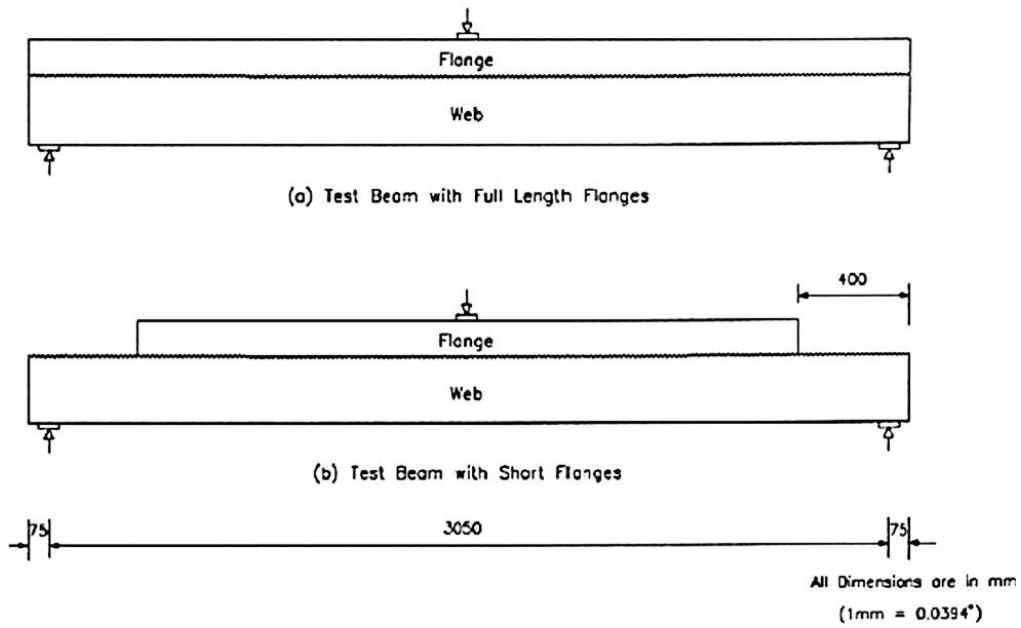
Typical test beams (Loov and Patnaik, 1994)
